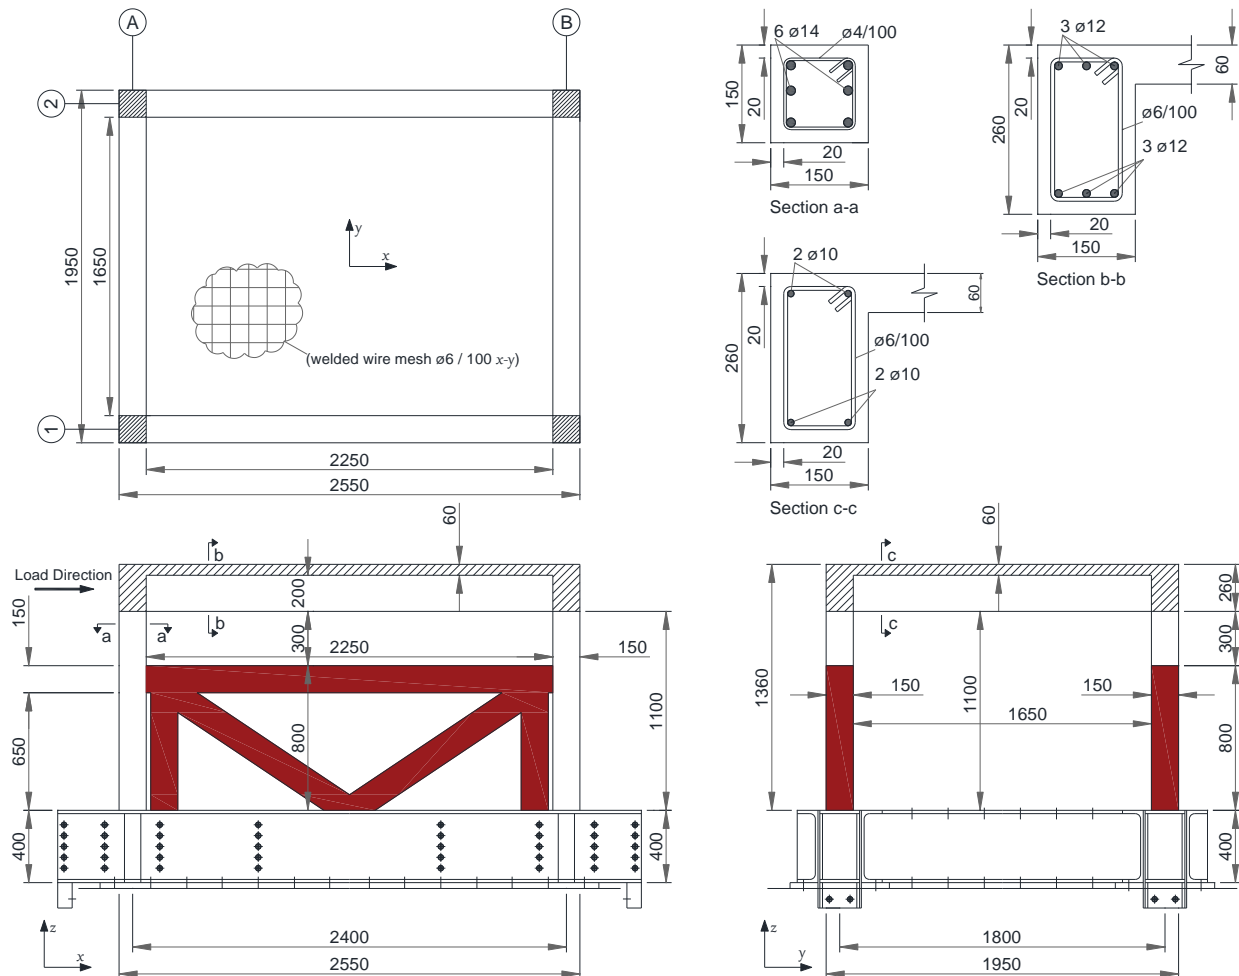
Geometry of the tested building and cross-sections of the main structural elements
